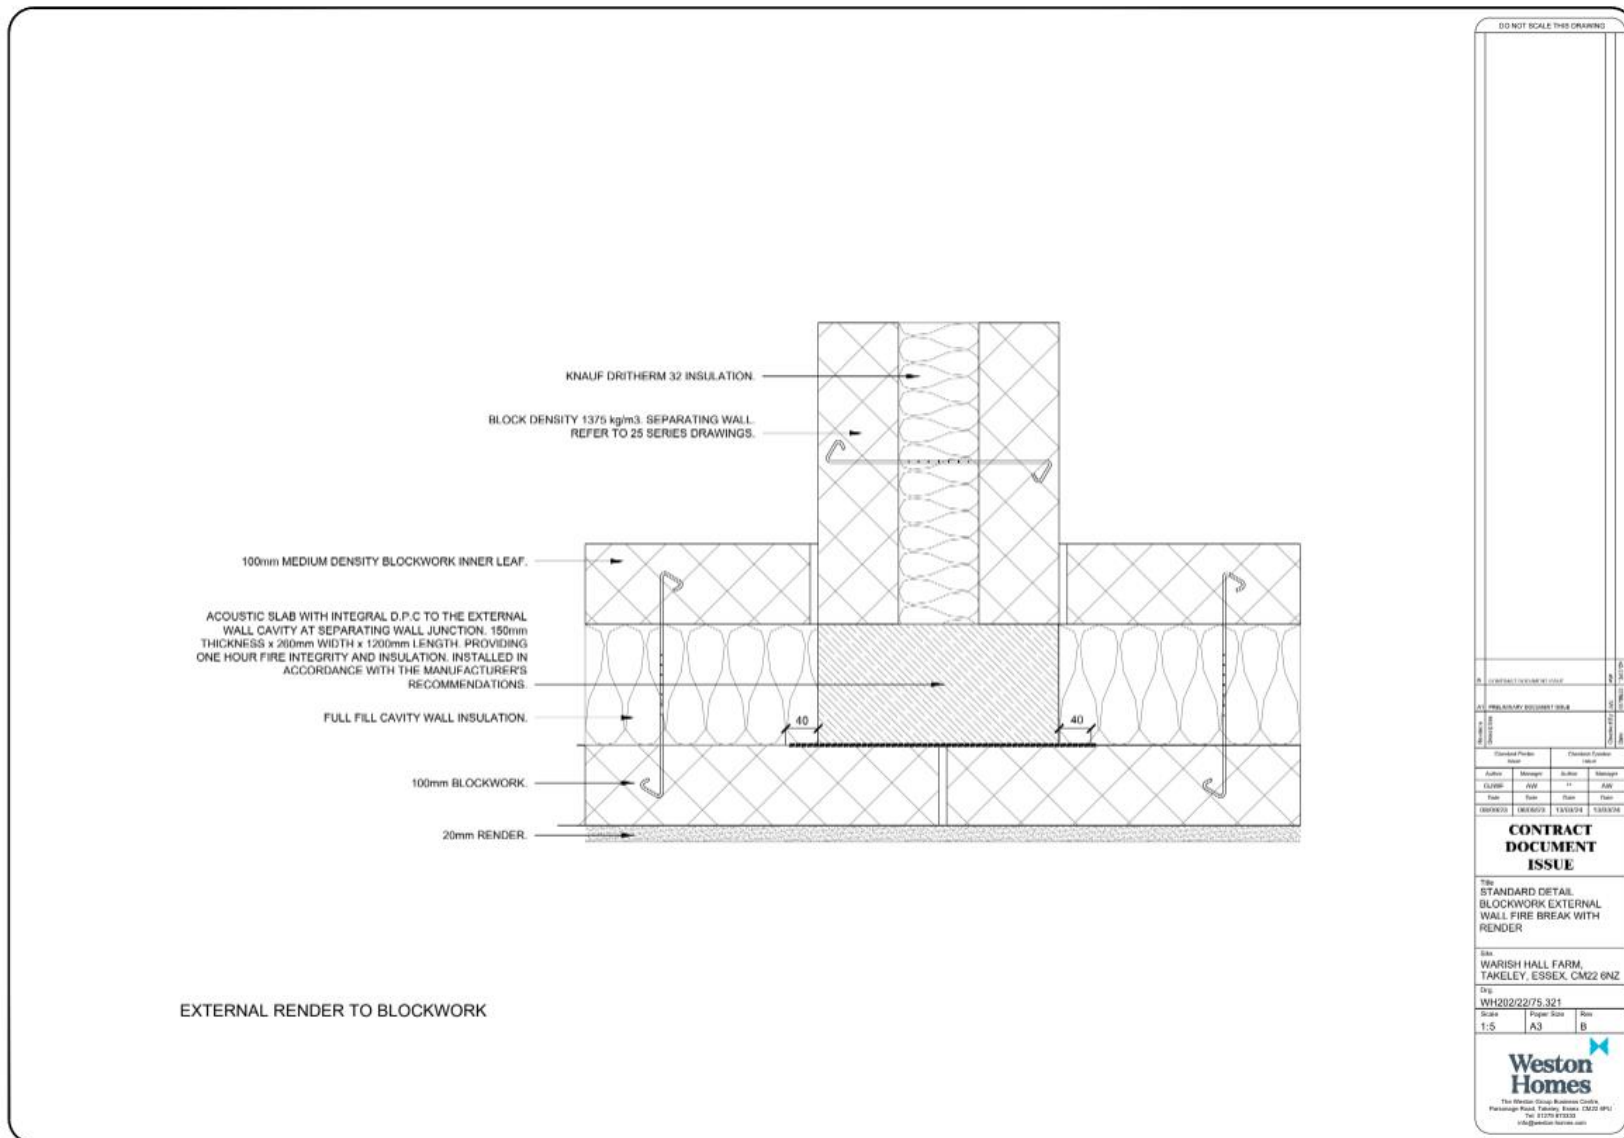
External Wall Construction Drawing WH202/22/75.321 – Jacks Lane
